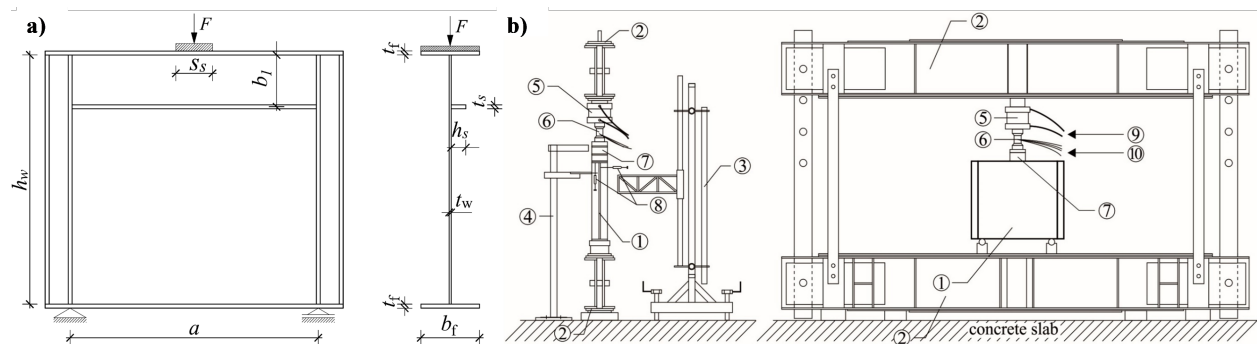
a) Notation used for longitudinally stiffened plate girders subjected to patch loading; b) Schematic view of a girder and used equipment: 1) test girder, 2) closed frame, 3) frame-slider for guiding transducer for the web deformation, 4) frame-slider for holding transducer for the flange deformation, 5) press, 6) load cell, 7) rigid steel block, 8) transducers, 9) pipes for oil supply for hydraulic pump, 10) electrical cables for connection with measuring devices
